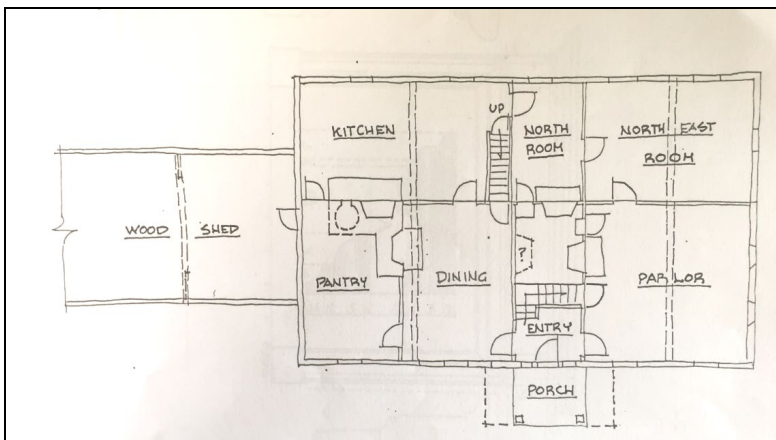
First Floor Sketch Plan, SPNEA, 1976,
